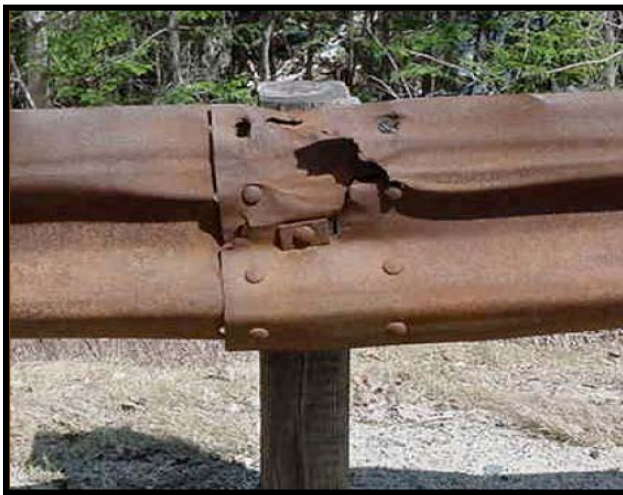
Weathered Steel Beam Guardrail Installation in New Hampshire (Perkins 2004)
